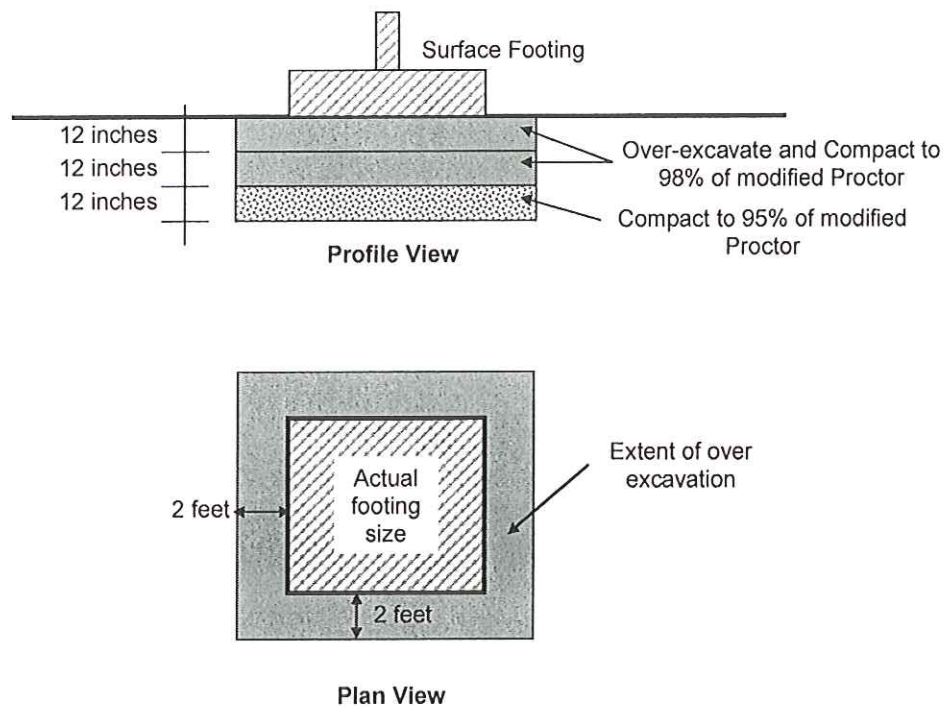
Sketch showing over-excavation, compaction, re-fill, and final compaction at footing locations
